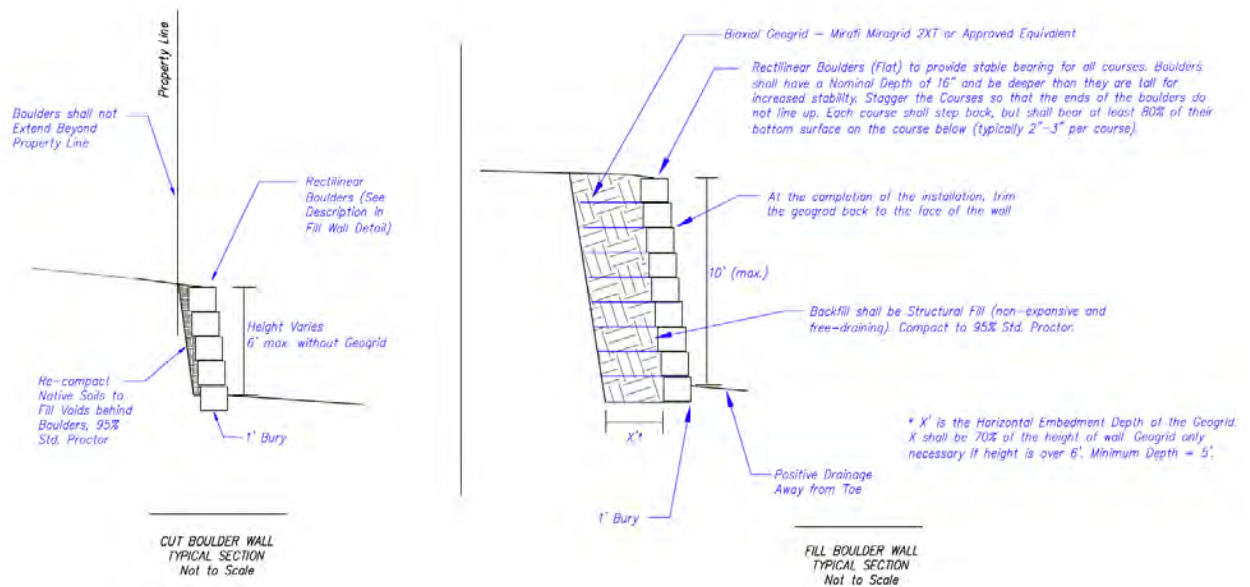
Retaining wall (Cut Boulder Wall, left; Fill Boulder Wall, right)
